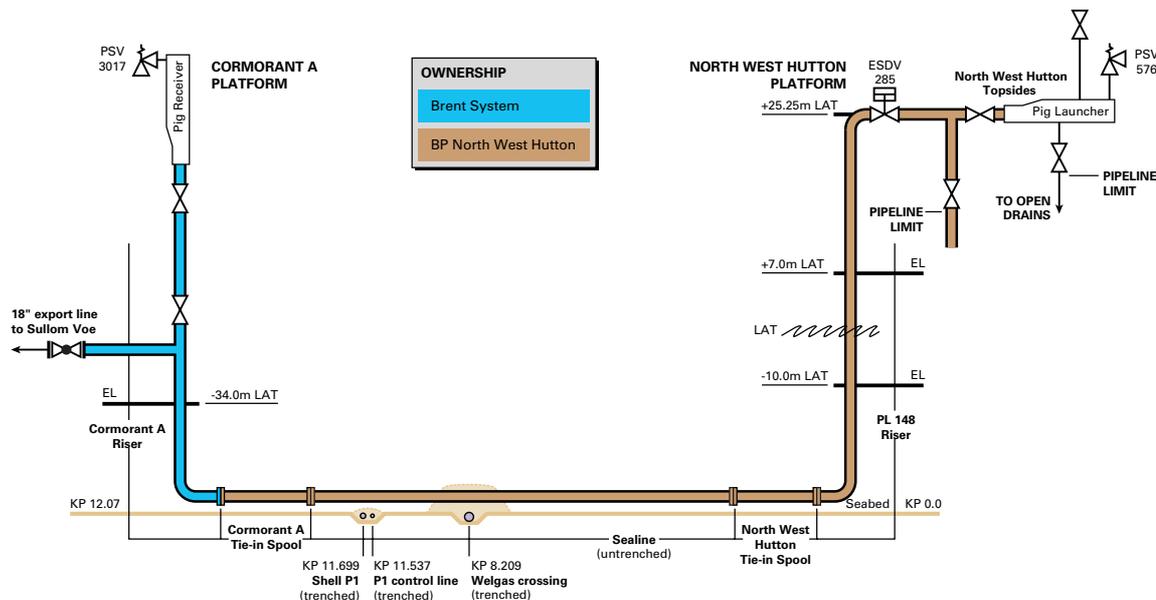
Schematic showing details of the 20" oil pipeline PL 148 (not to scale).
